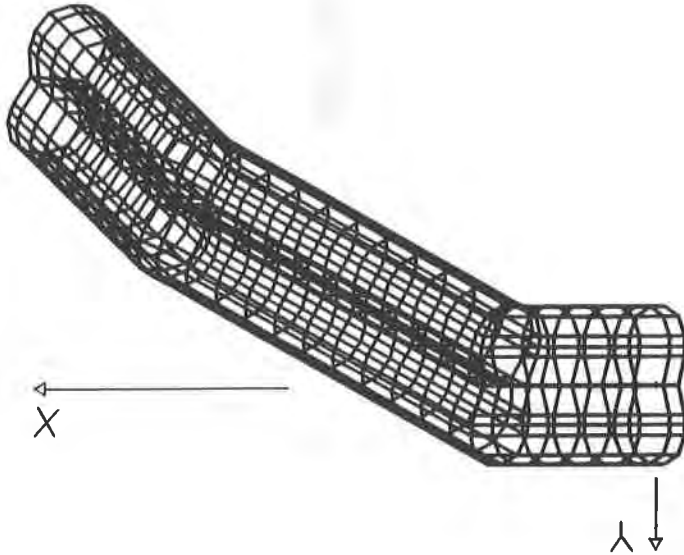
PERSPECTIVE VIEW OF AN UNDERGROUND TUNNEL (EXAMPLE 1)
